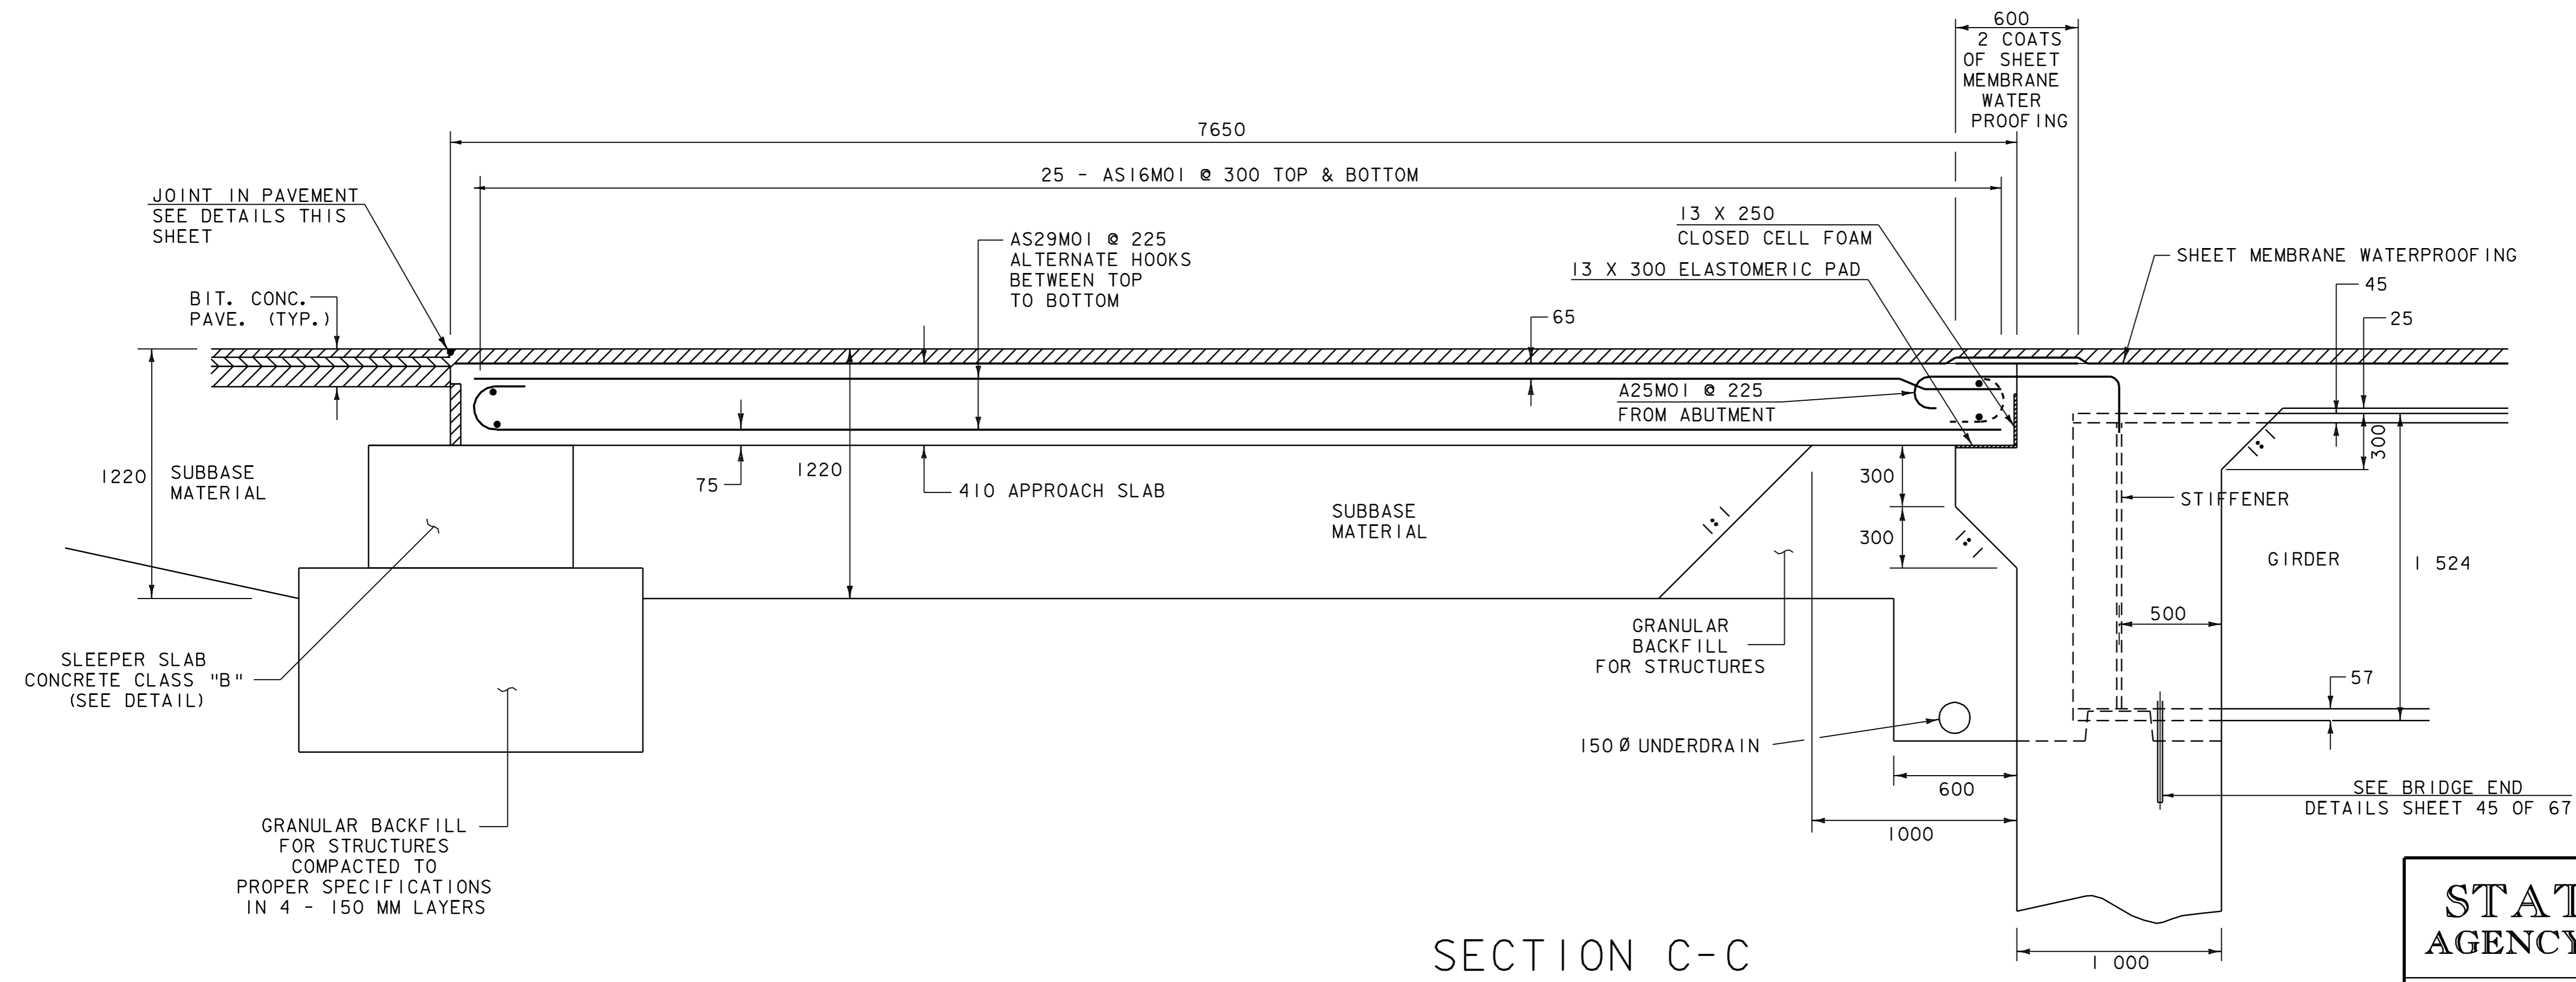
DETAIL FOR JOINT IN PAVEMENT AND SHEET MEMBRANE AT END OF APPROACH SLAB
